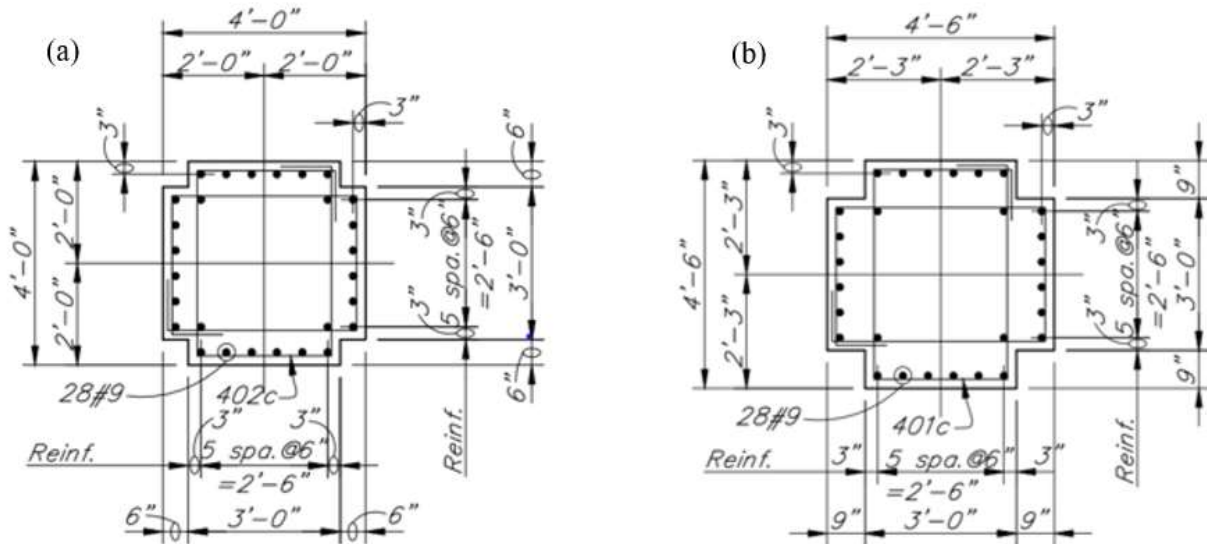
Typical Cross-Section of Column Type 1 (a) and Column Type 2 (b) (NBI 18790) (2014)
